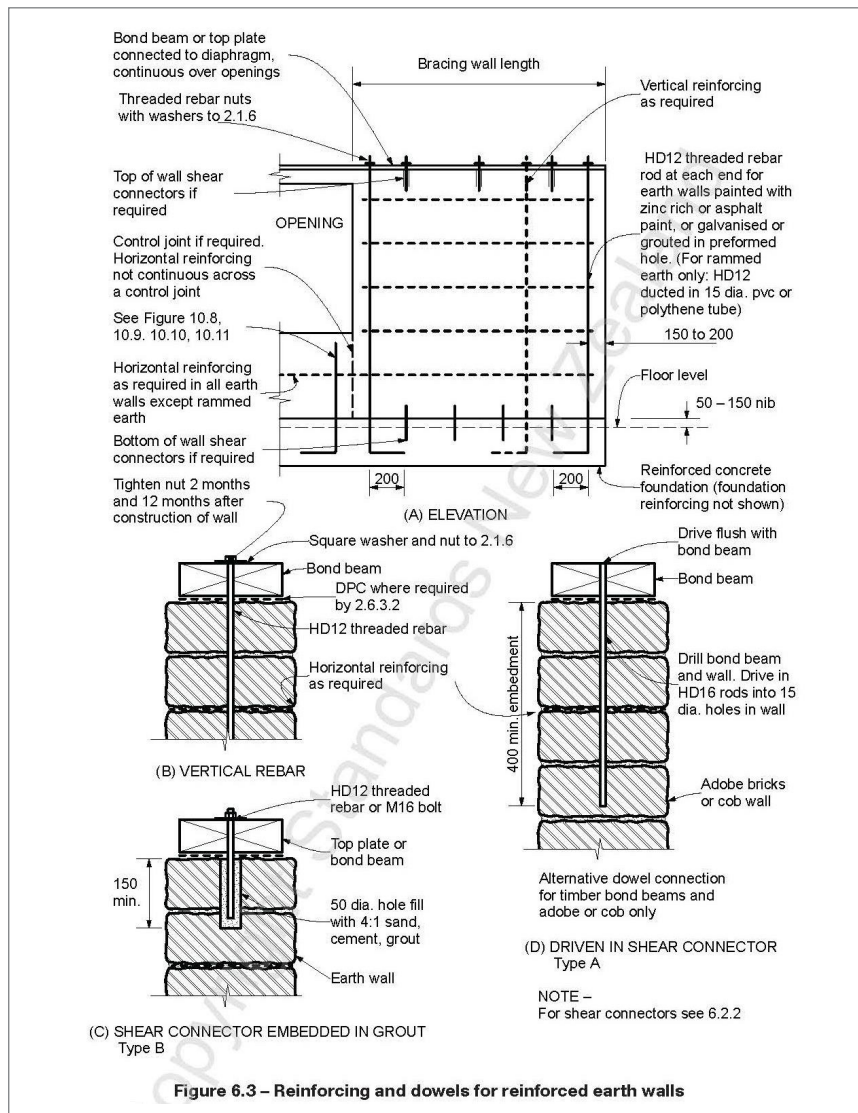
Reinforcing and dowels for reinforced earth walls
